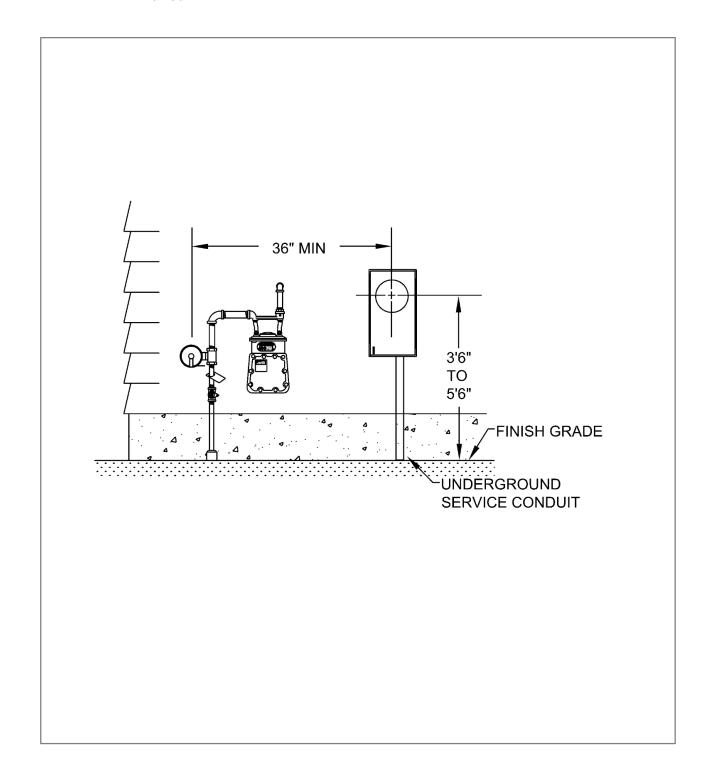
Underground Secondary Service Residential Meter Connection Conduit or Direct Buried
